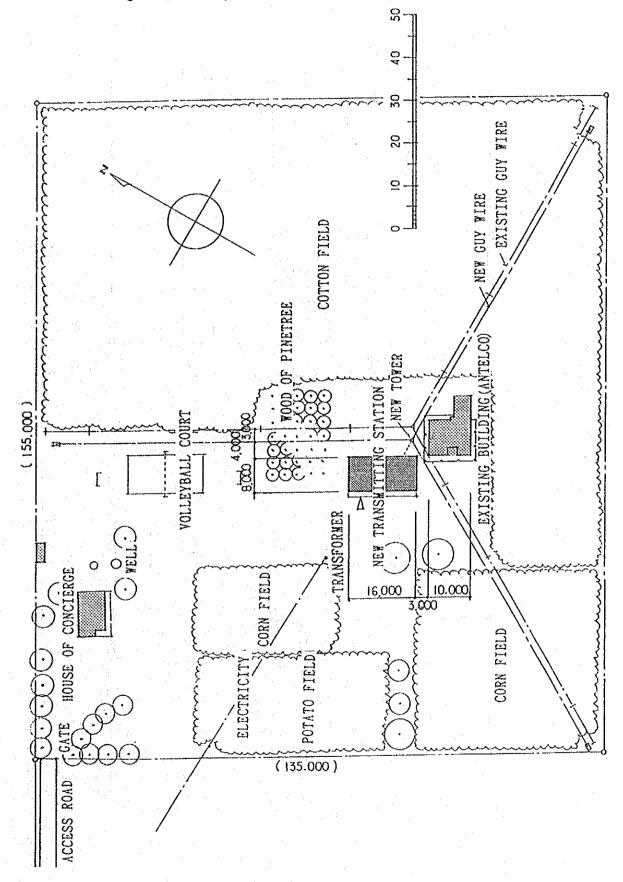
Layout Plan of Broadcasting Station in Encarnation.
